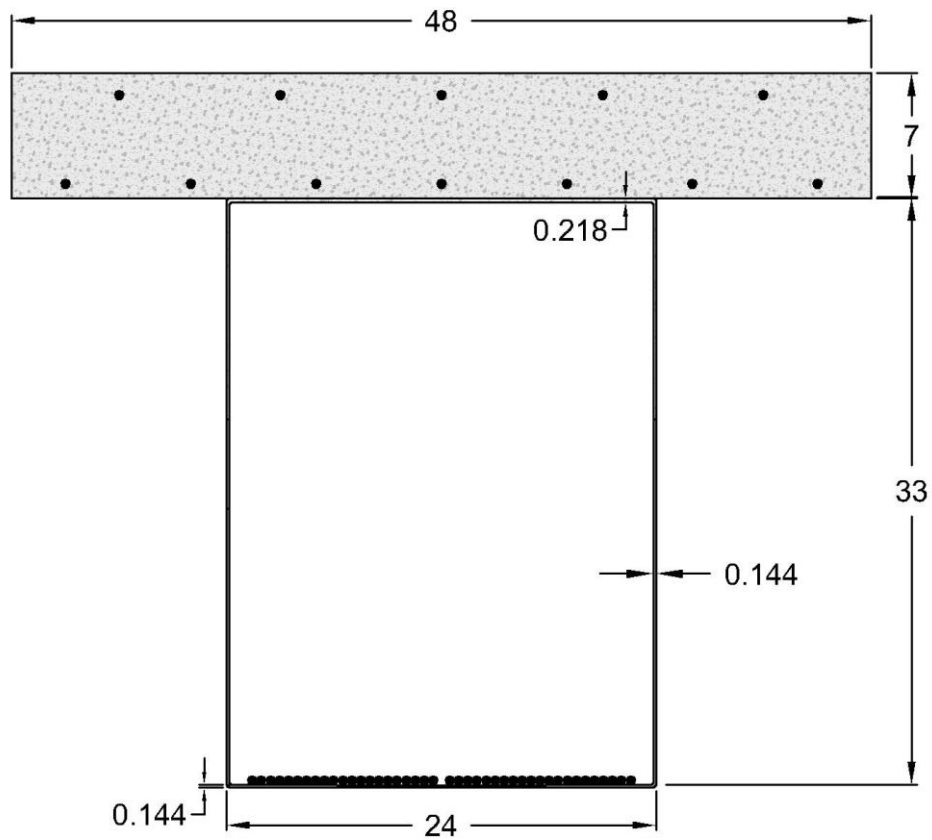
Cross section of box beam for Case A. (Dimensions in inches)
